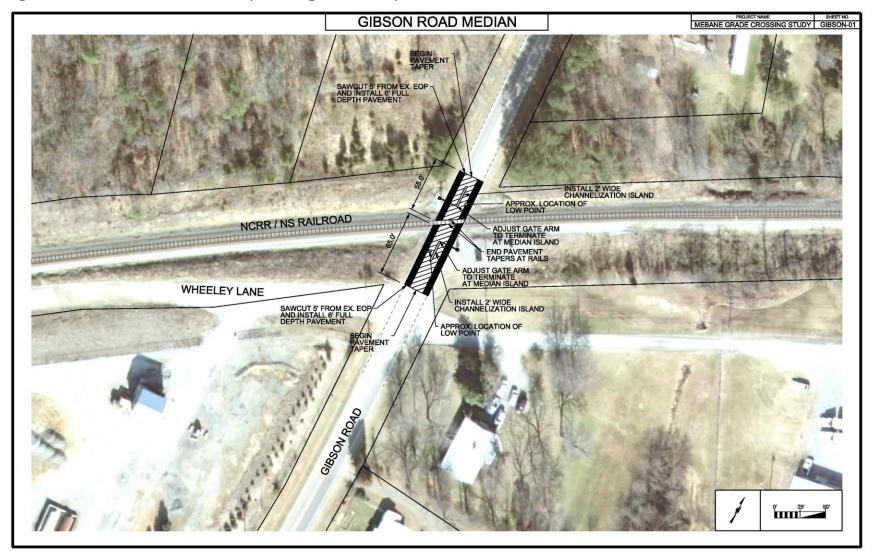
SR 1940 – Gibson Road (Crossing # 735 464L) Recommendations
